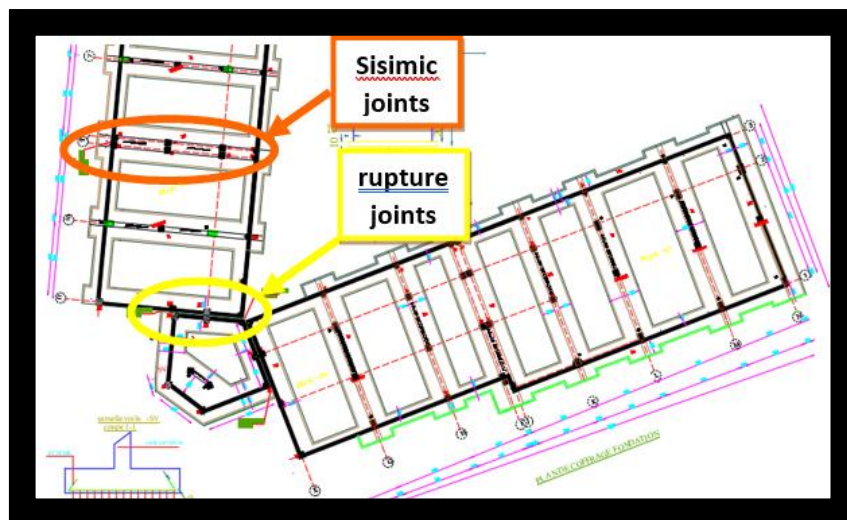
the joints in the plan ,Source : Formwork and Reinforcement Plan adapted by the author 2025
